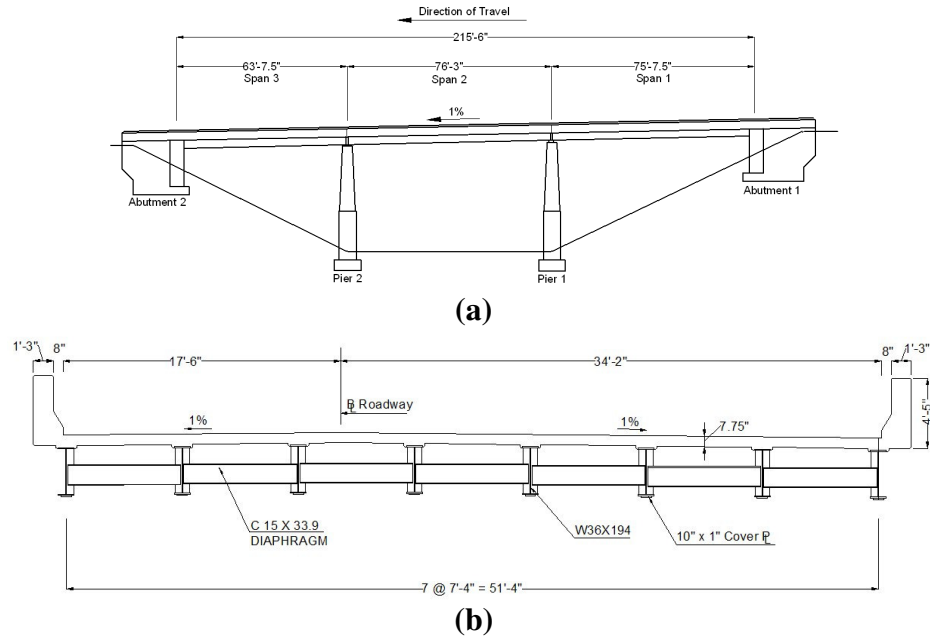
Elevation (a) and Cross Section (b) of the Composite Steel Girder Bridge.
